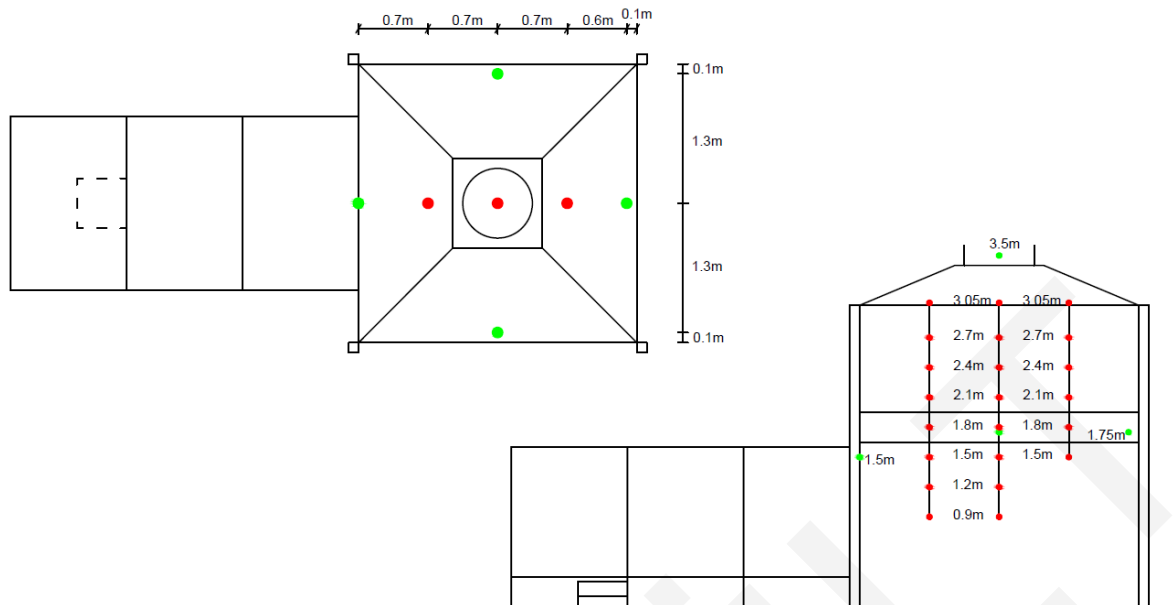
Positions of thermocouples, Top view (left) and Side view (right)
